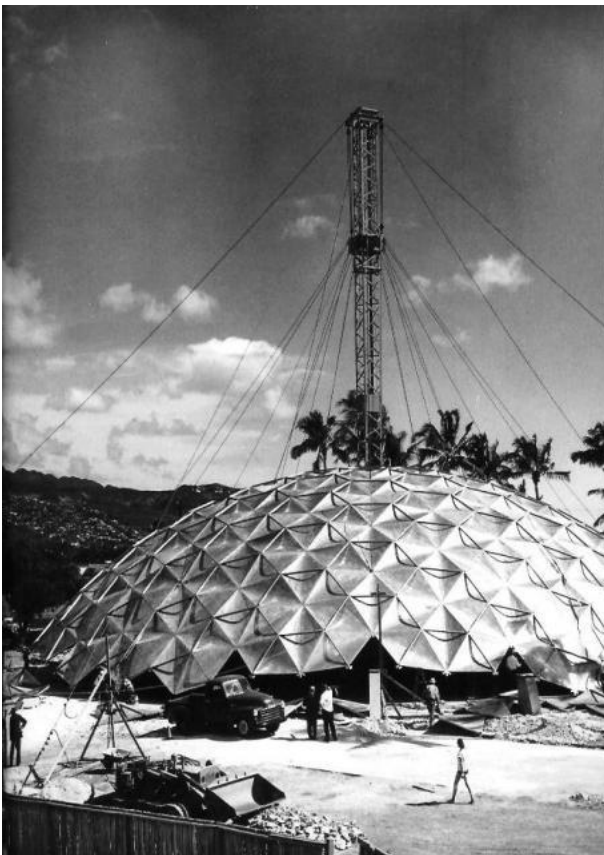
Fuller dome construction, Honolulu, Hawaii, 1957
